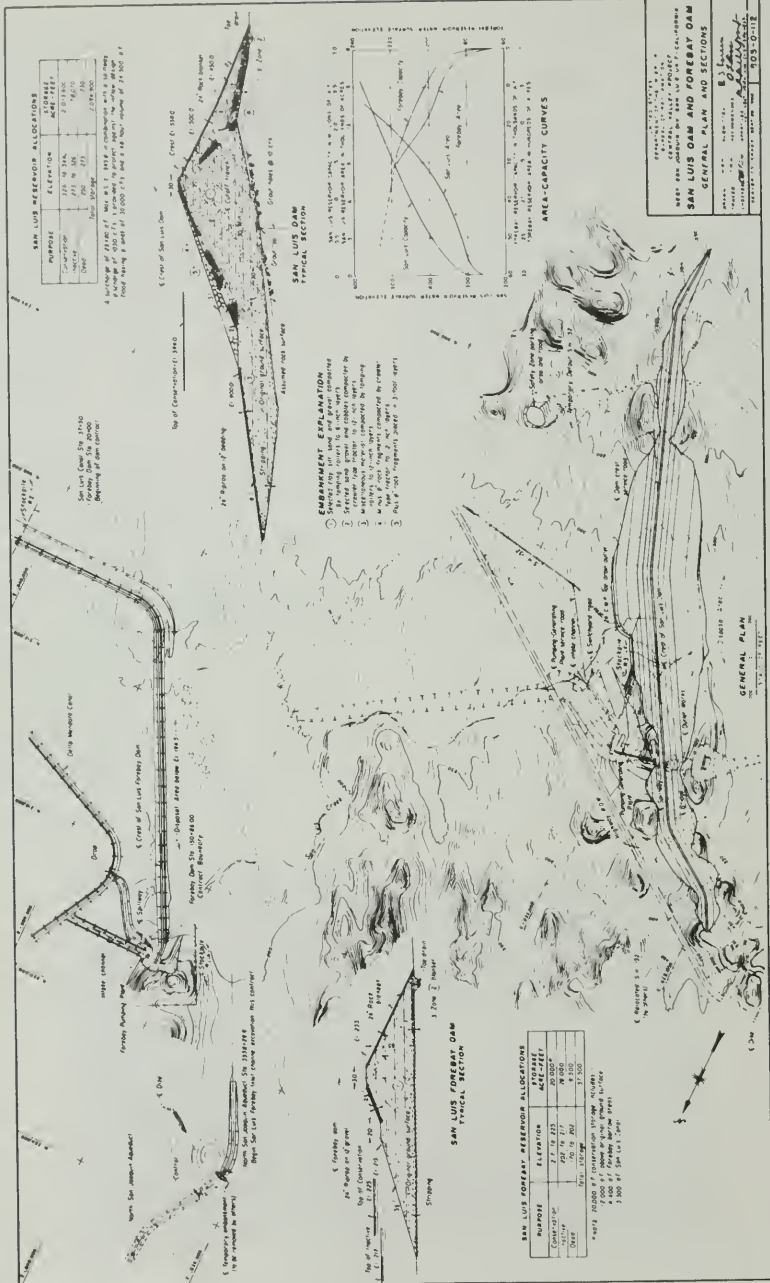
General Plan and Sections of San Luis Dam and O'Neill Forebay
